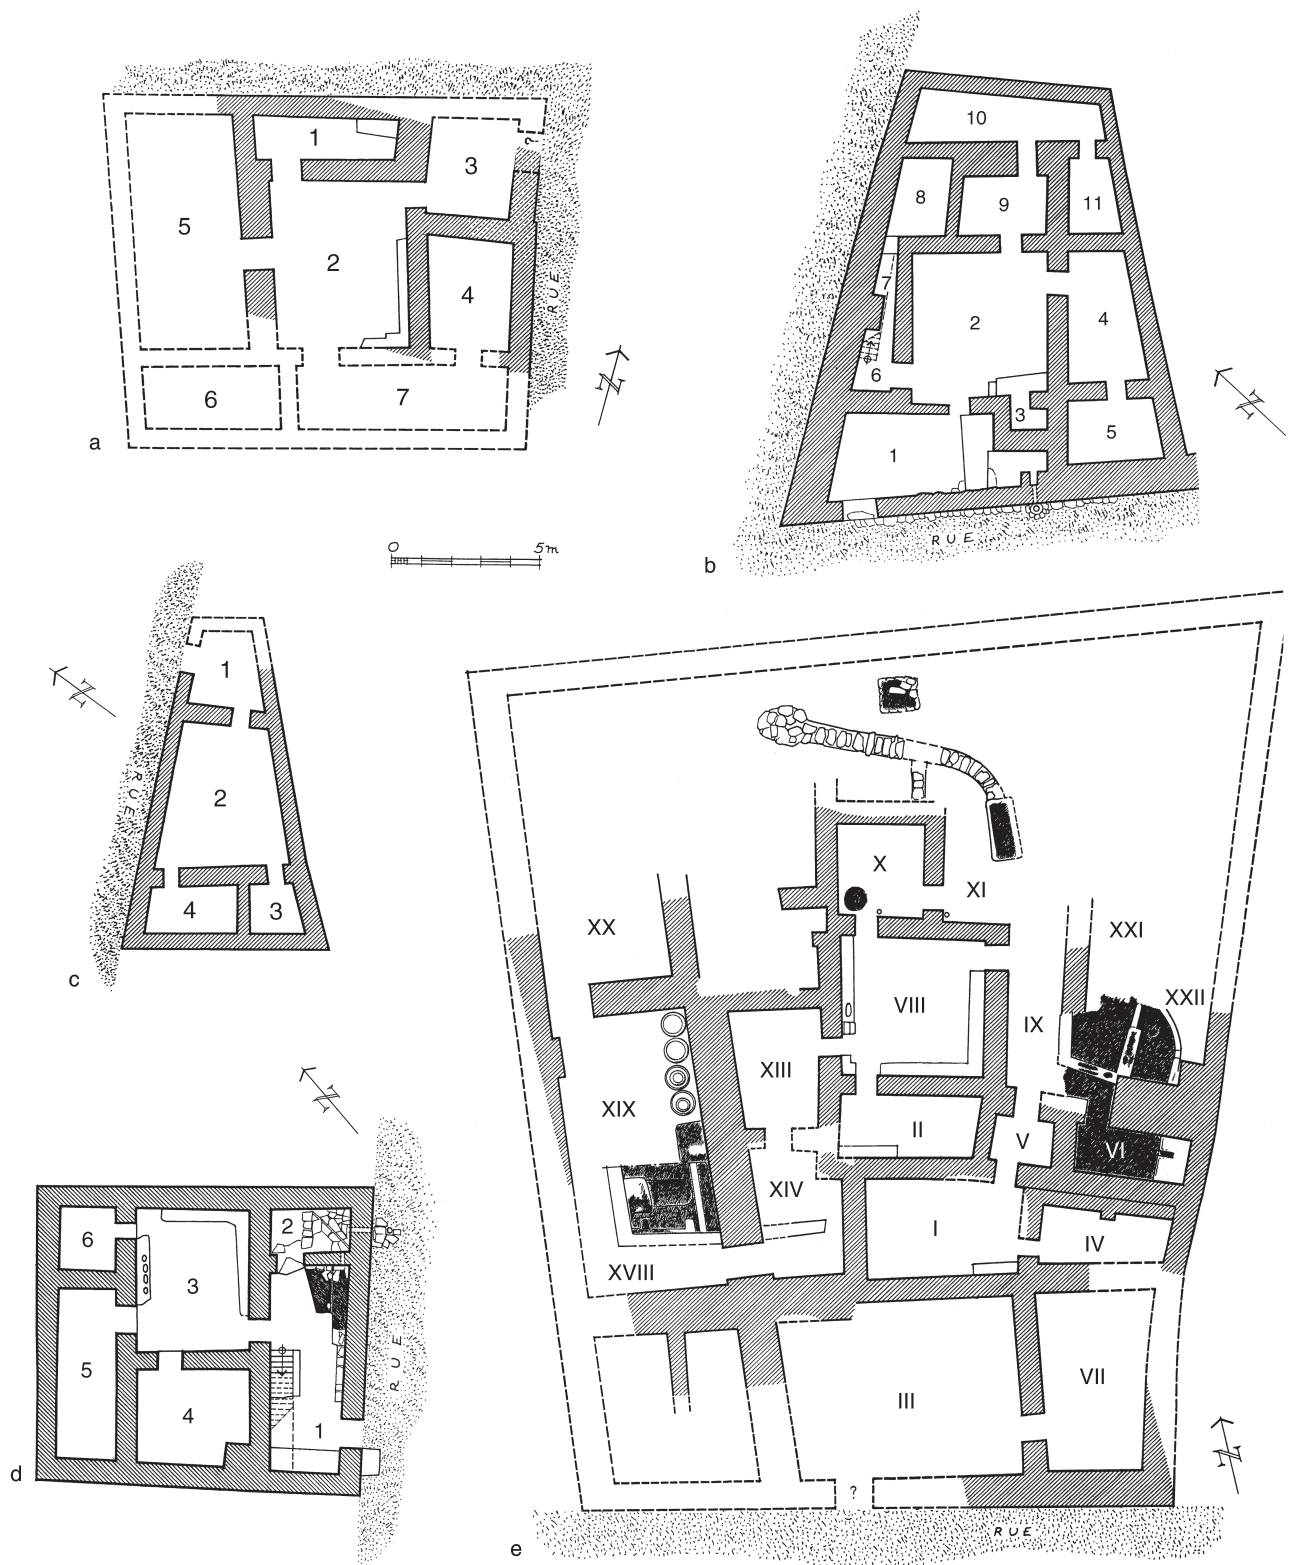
The domestic architecture of City II: [a] House of the Mongoose Trap (excavation area F); [b] and [c] two houses north of the Souk; [d] The Red House; [e] The House of Artisans' Installations of excavation area B.
